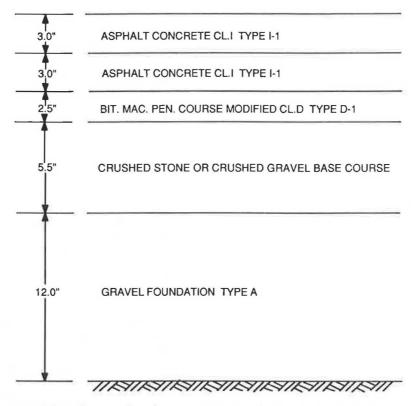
Cross-section of pavement structure for the Rhode Island site.
